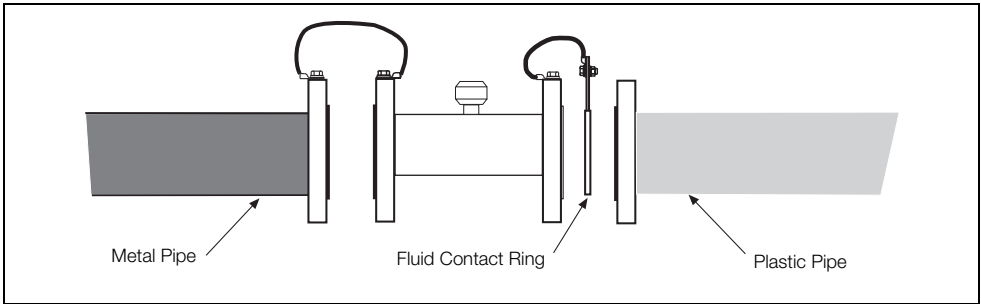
Flanged Metal Pipe to Plastic Pipe
